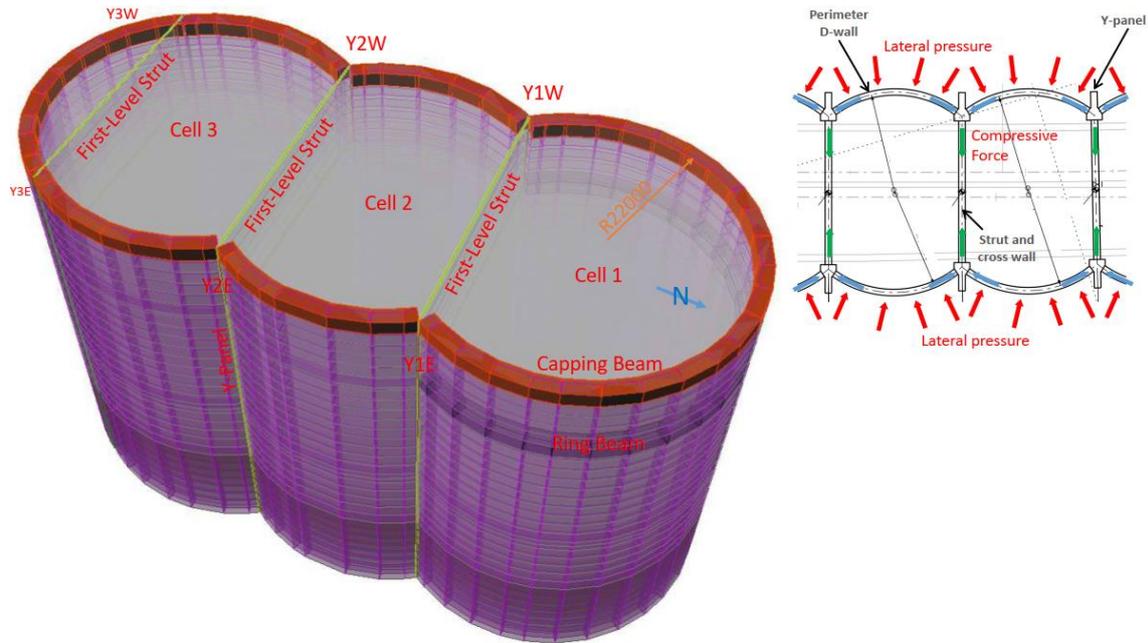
3D view and load path of a Peanut-shaped Cofferdam.
